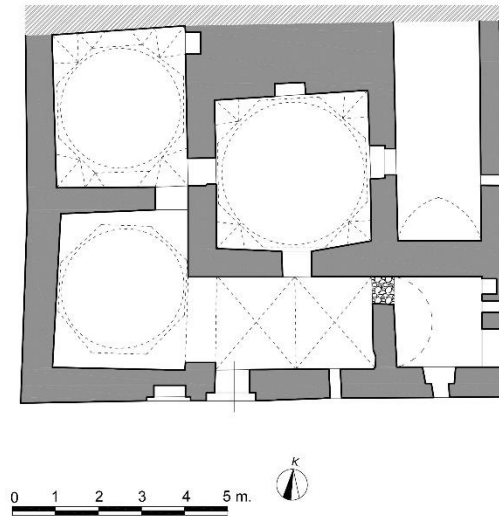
Plan of the Yivli Minaret Bath (edited from Yılmaz)
